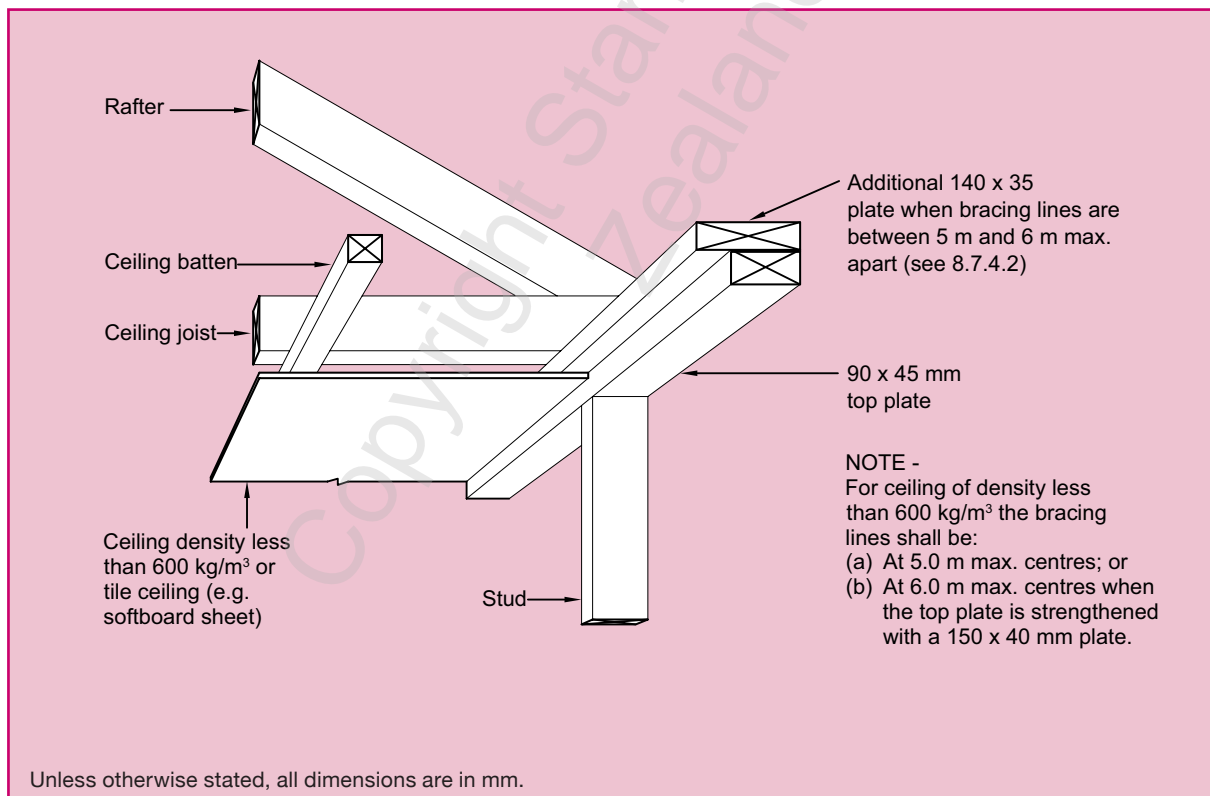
Strengthening top plate for low density ceilings (against horizontal forces) (see 8.7.4.2)
